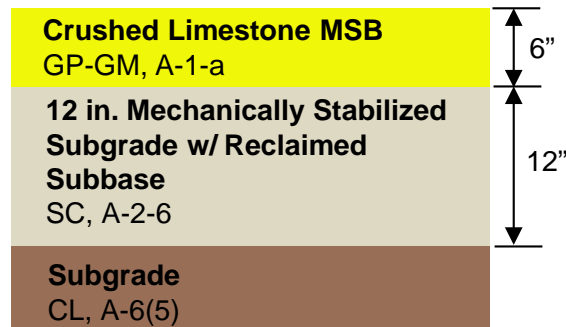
Pavement foundation profile on 2nd St. North and South test sections
